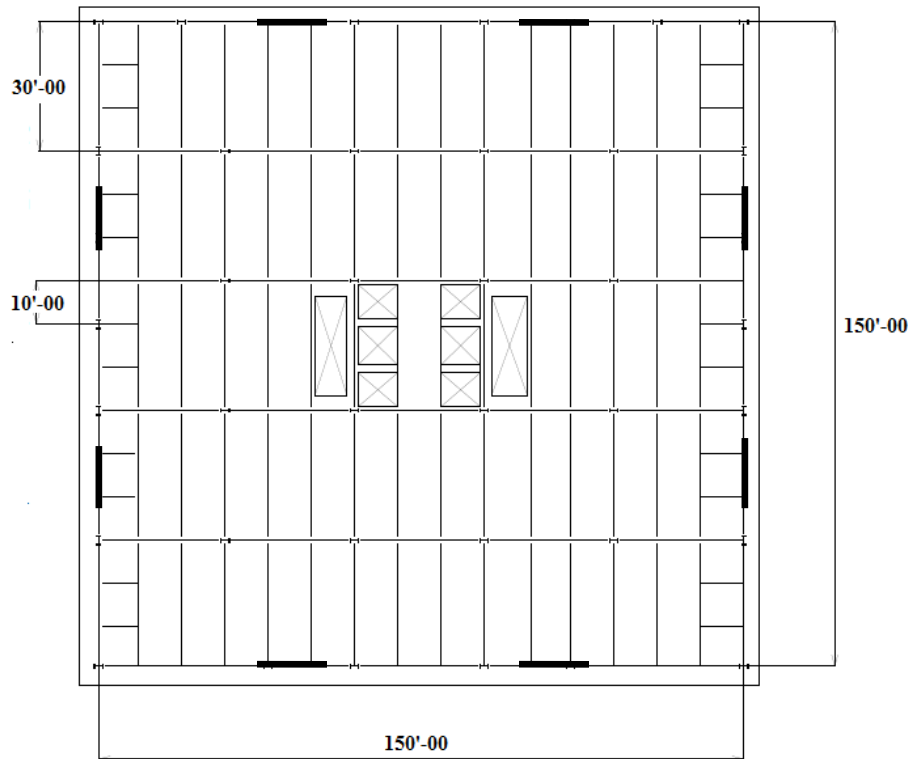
Schematic Plan of the Building and Location of CFSSP-Walls
